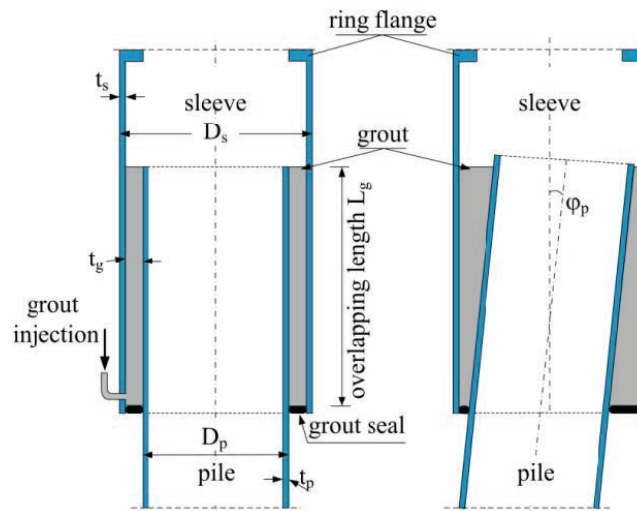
Grouted joint with plain cylindrical tubes [9].
